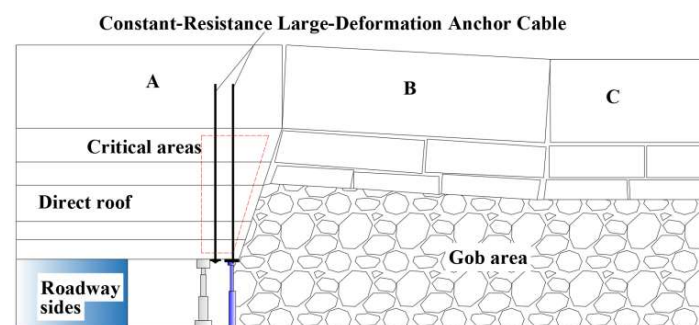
Position of constant-resistance large-deformation anchor cable support.
